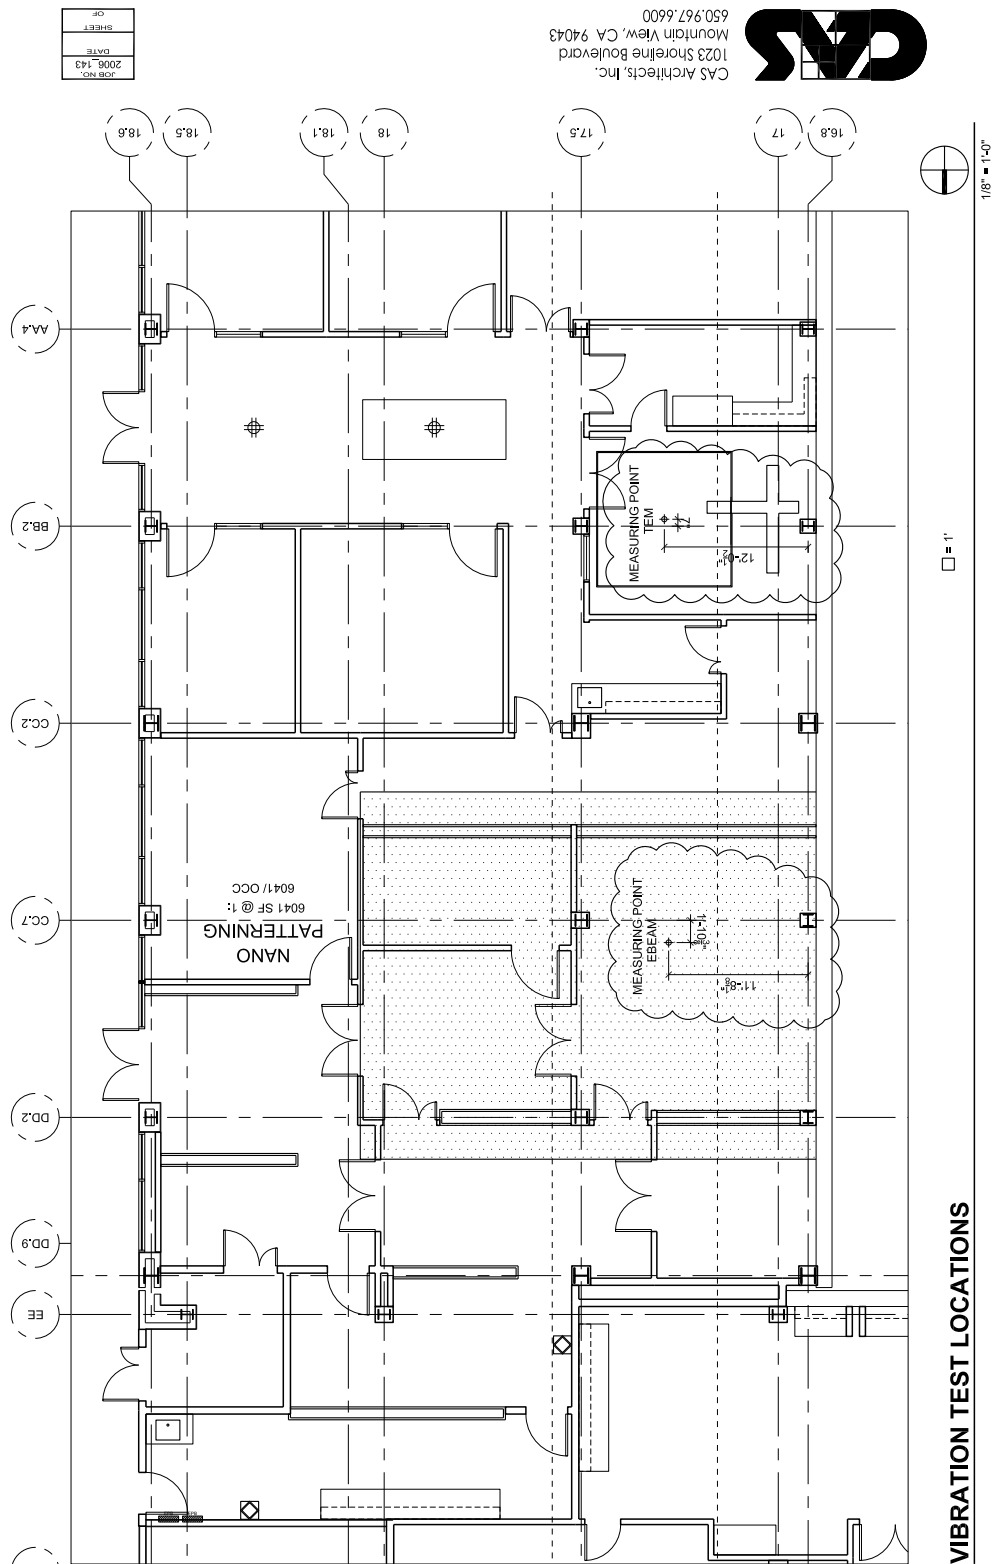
Location of the E-Beam and TEM instruments floor motion study in the Spilker Building during construction.
